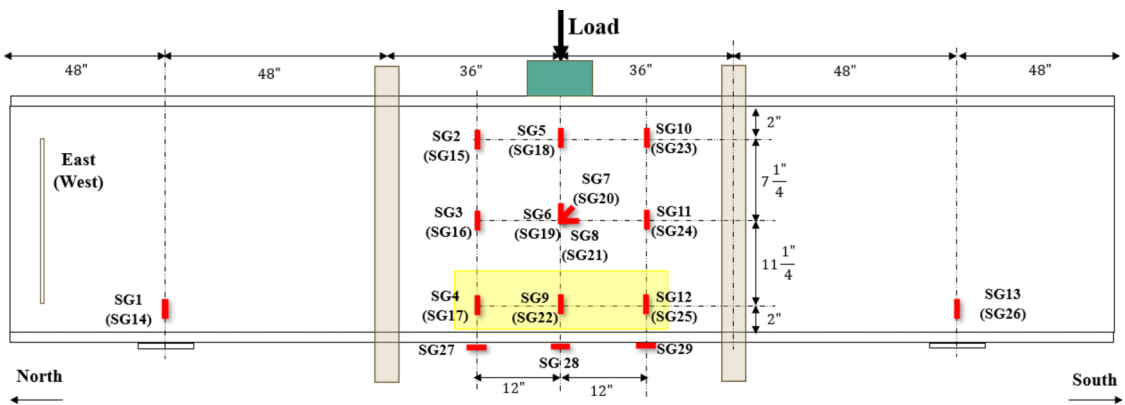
Strain gauge layout (side elevation): Specimen 7.
